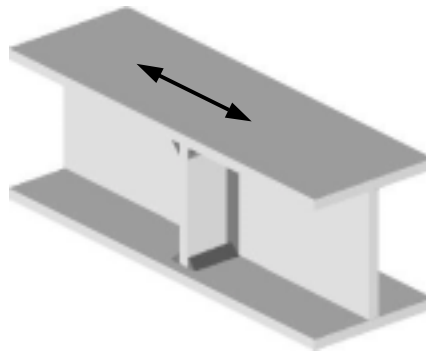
Transverse fillet welded section of the web-stiffener connection.
